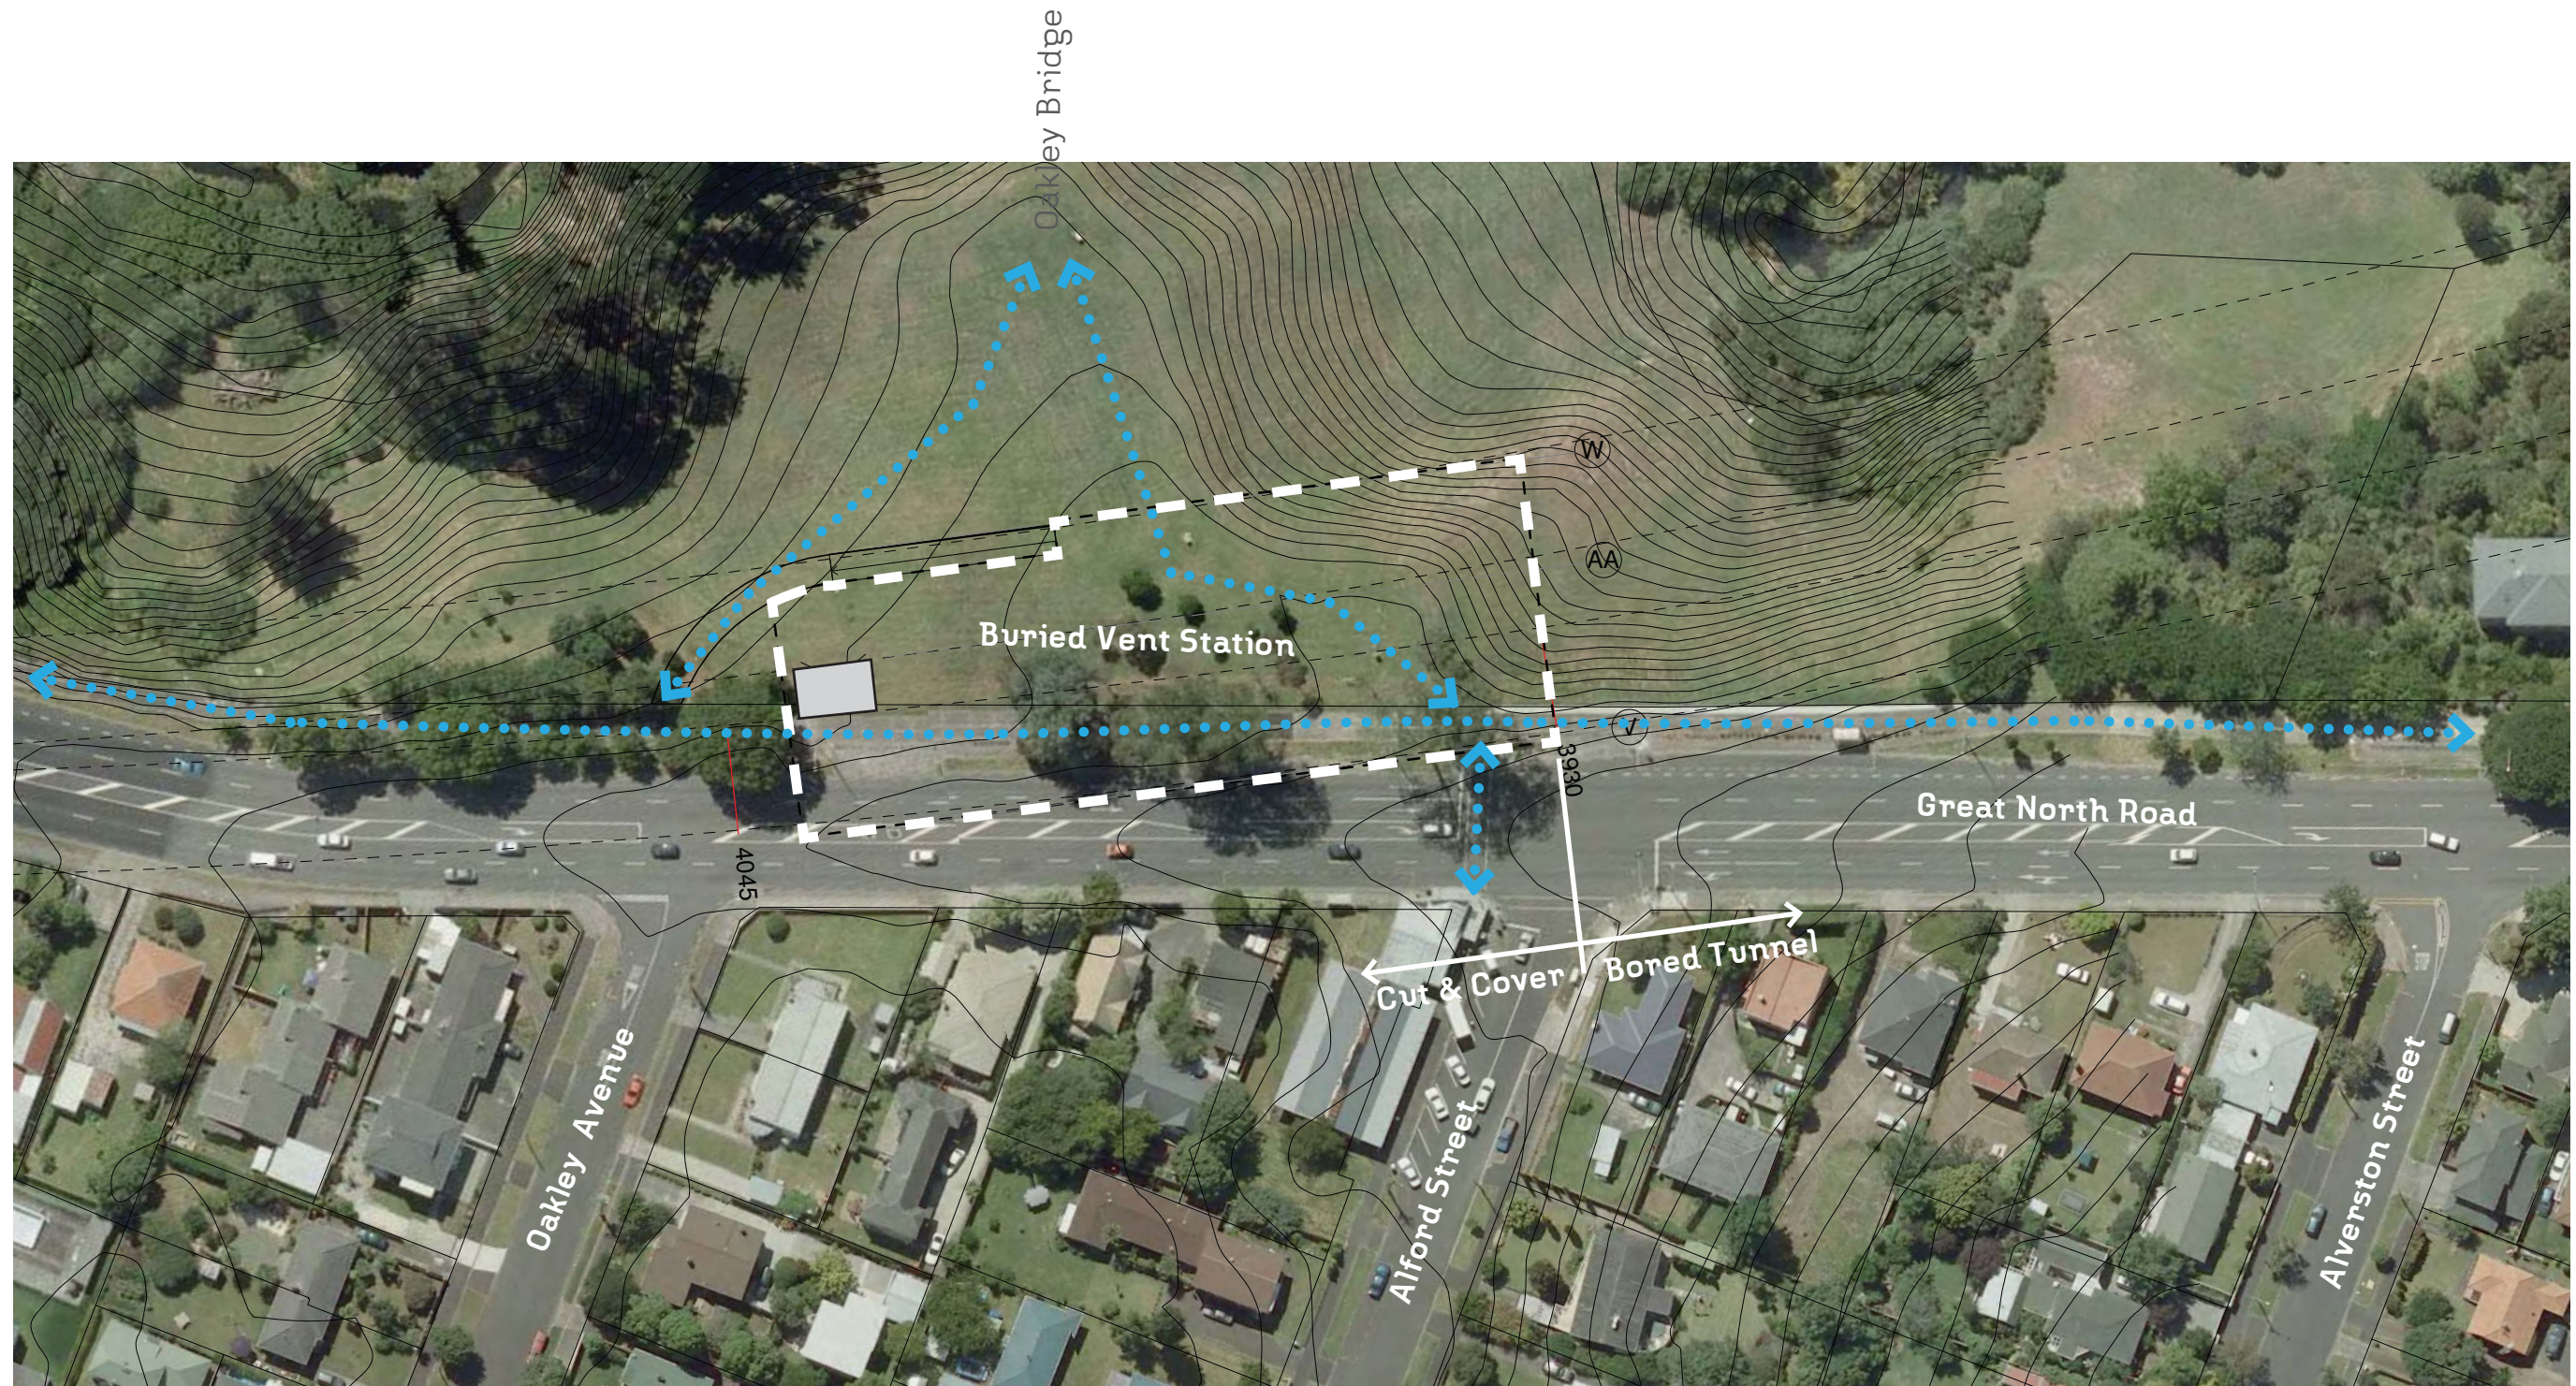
Ventilation building – Oakley Reserve location plan (Concept Option B)
